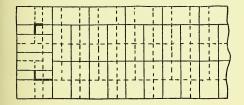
Two-and-a-half Brick Wall in English Bond.
